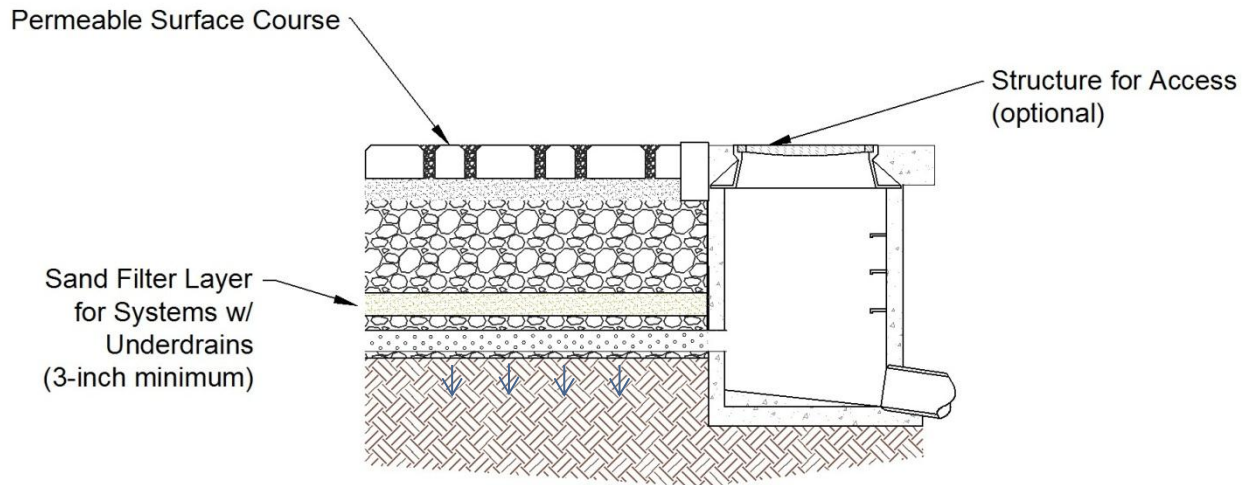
Configuration 3 – Infiltration permeable pavement with underdrain on the subgrade.
